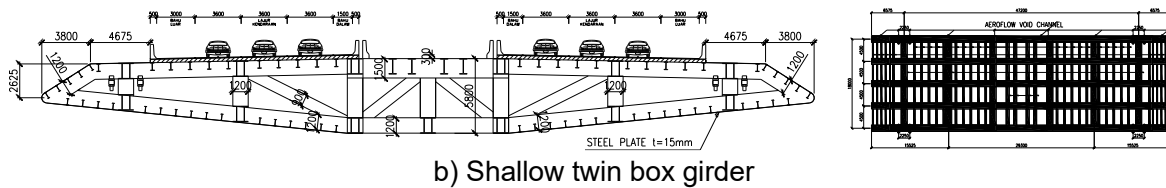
Stiffening girder of Sunda Strait Bridge (Unit: mm)
